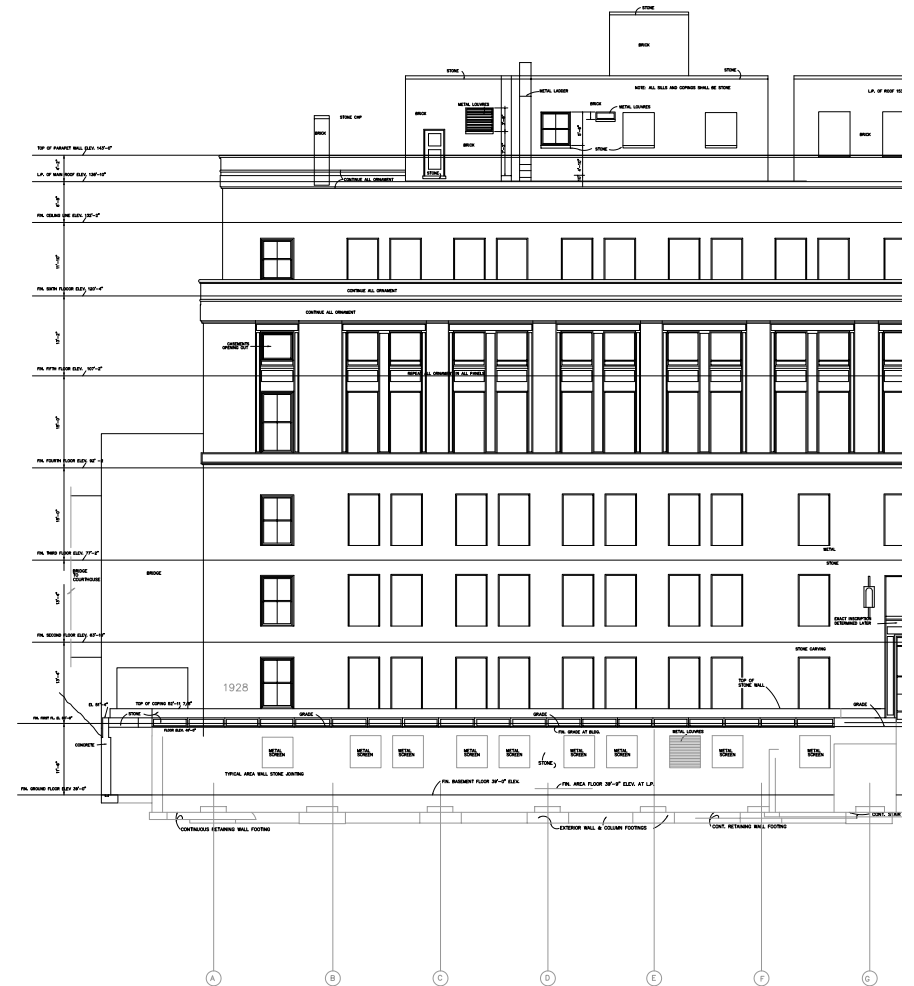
Partial Safety Building Elevation showing floor to floor heights
